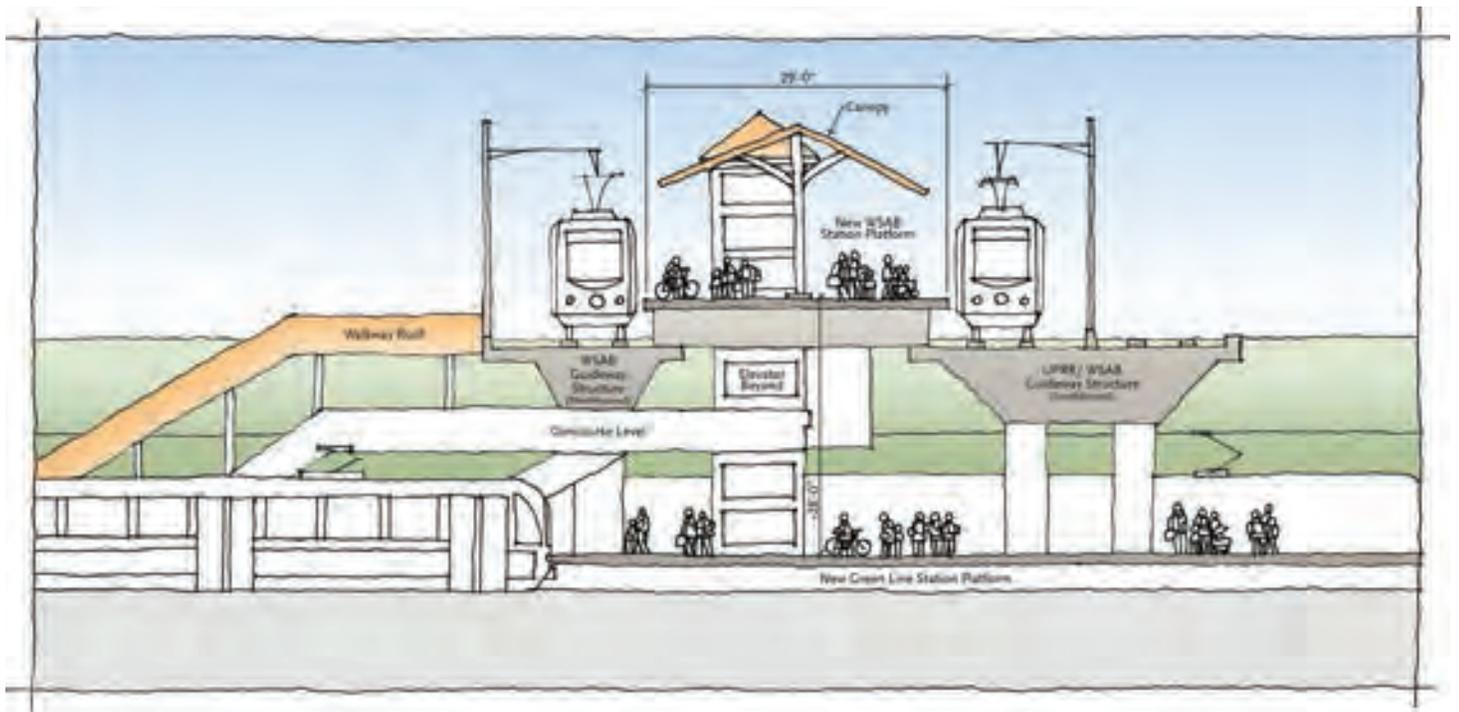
Cross-section through new WSAB/Green Line Station platform (looking south to new Metro Green Line Station below)
